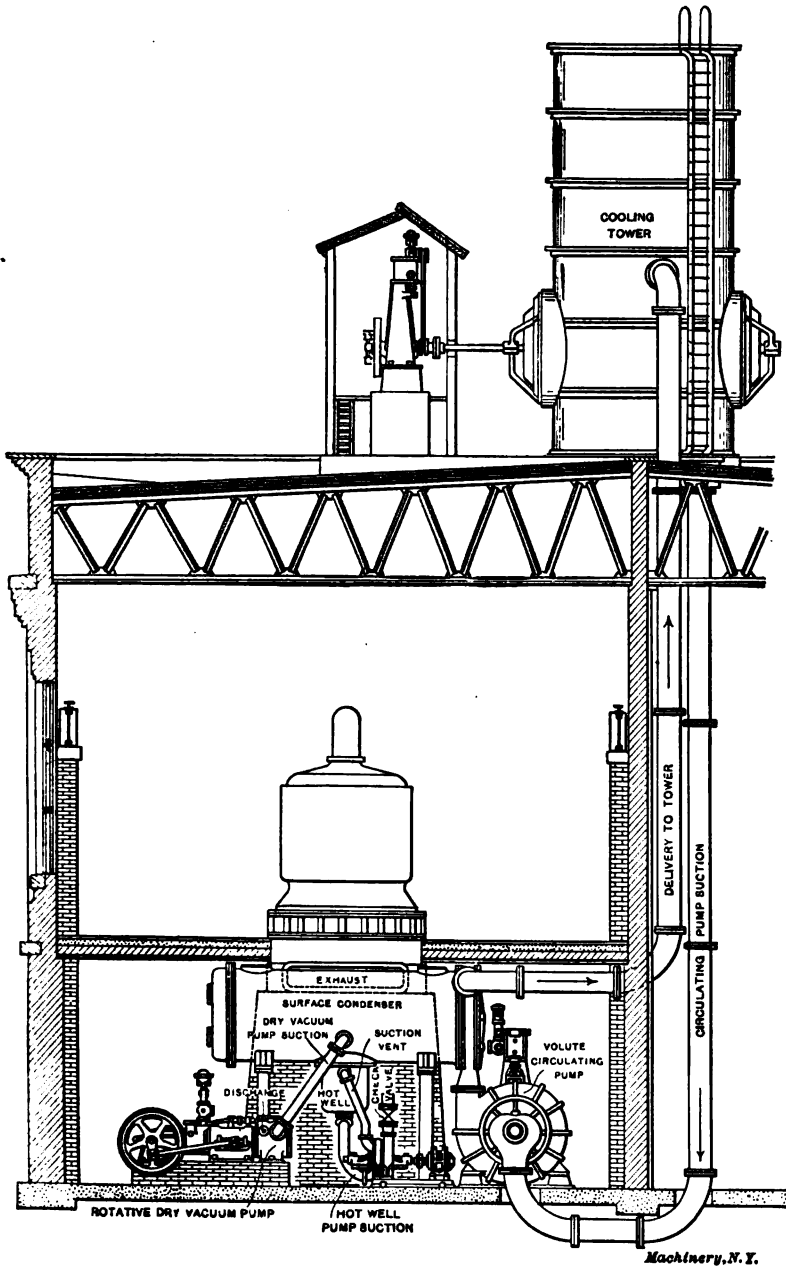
Installation Containing Steam Turbine, Surface Condenser, Pumps and Cooling Tower
